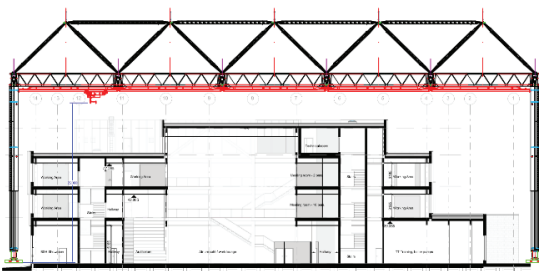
Site-cover planned as protection for the tallest part of the building. Arkitema/COWI
